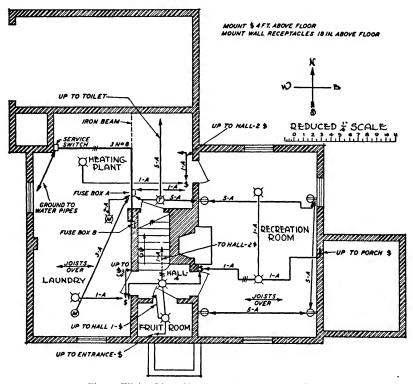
Wiring Plan of Basement in 1 1/2 - Story Building
